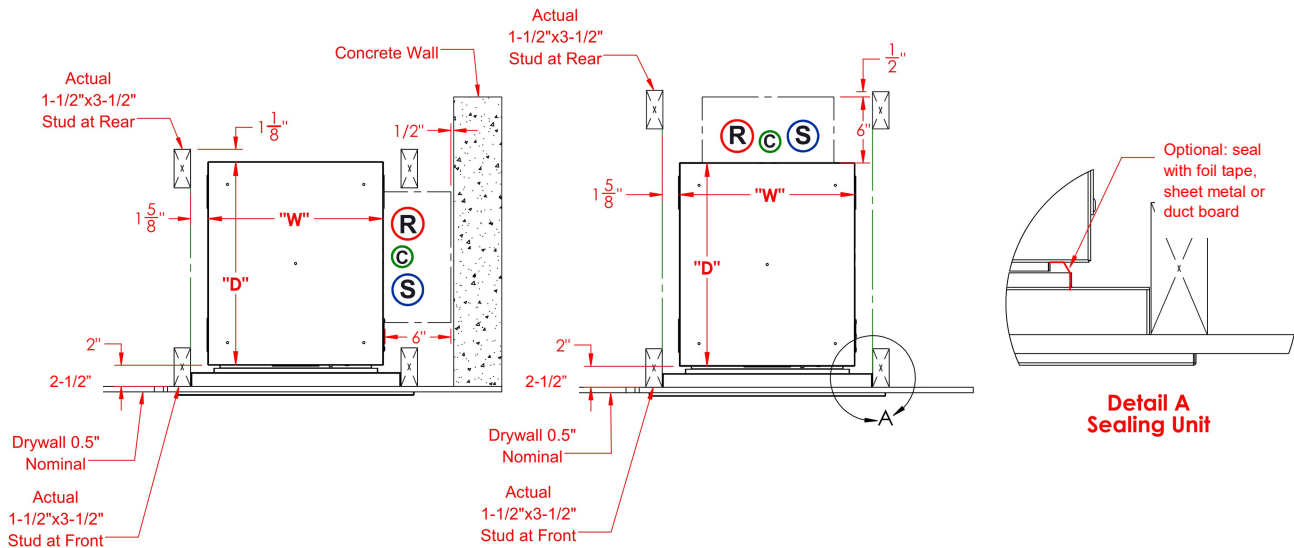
Perimeter Panel — Typ. 2x4 Framing Plan View
